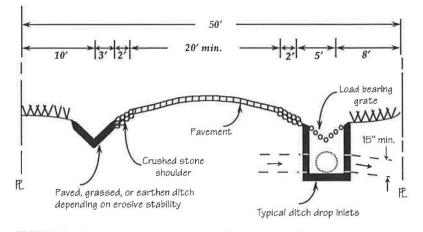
Cross section of typical urban local street, ditch section (not to scale).
